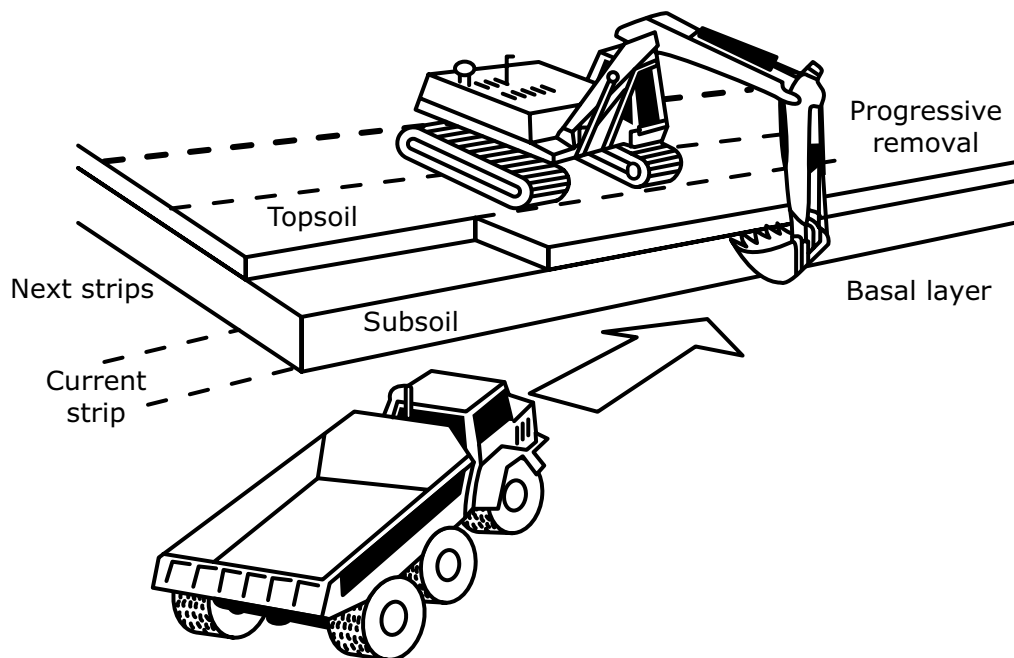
Stripping with excavators and dump trucks: removal of topsoil from a strip.
